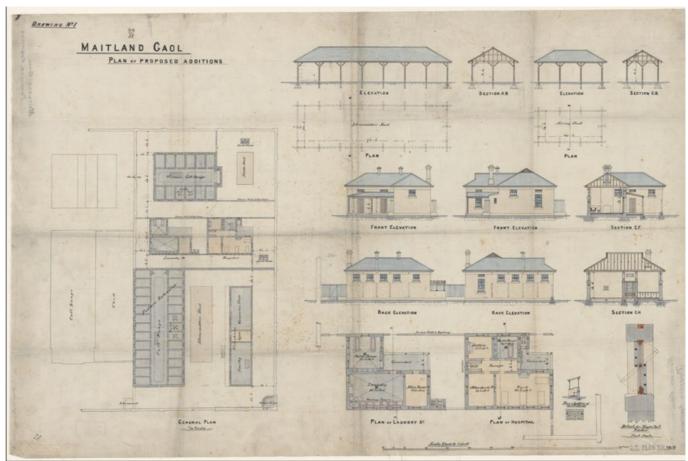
Original drawings for Maitland Gaol, proposed Stonecutters Shed, Laundry and Hospital.
